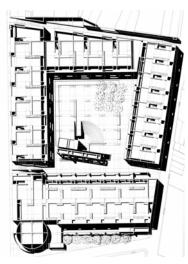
Courtyard building with long, narrow floor plates on all sides, provides generous natural light and shelter from wind
